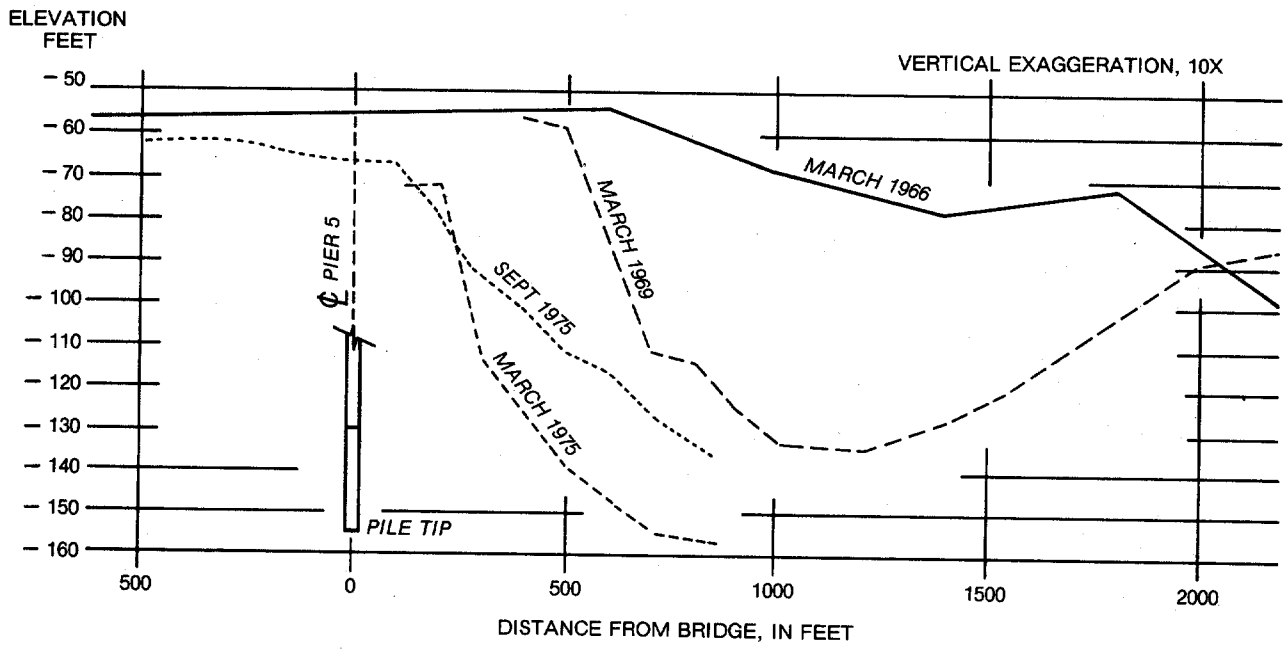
Longitudinal profiles of channel thalweg downstream from I-10 bridge.
